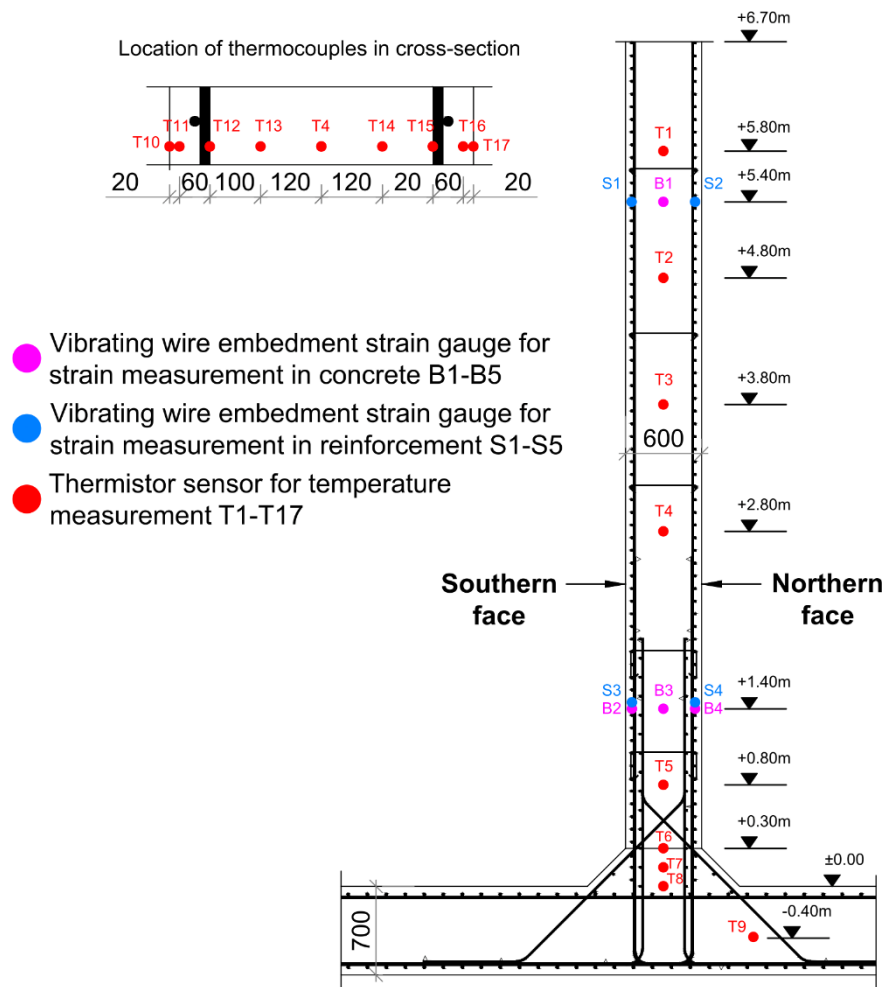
Reinforcement layout and arrangement of measuring sensors in the tank wall segment.
